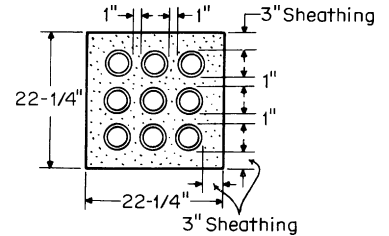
Arrangement of conduit with concrete sheath.
